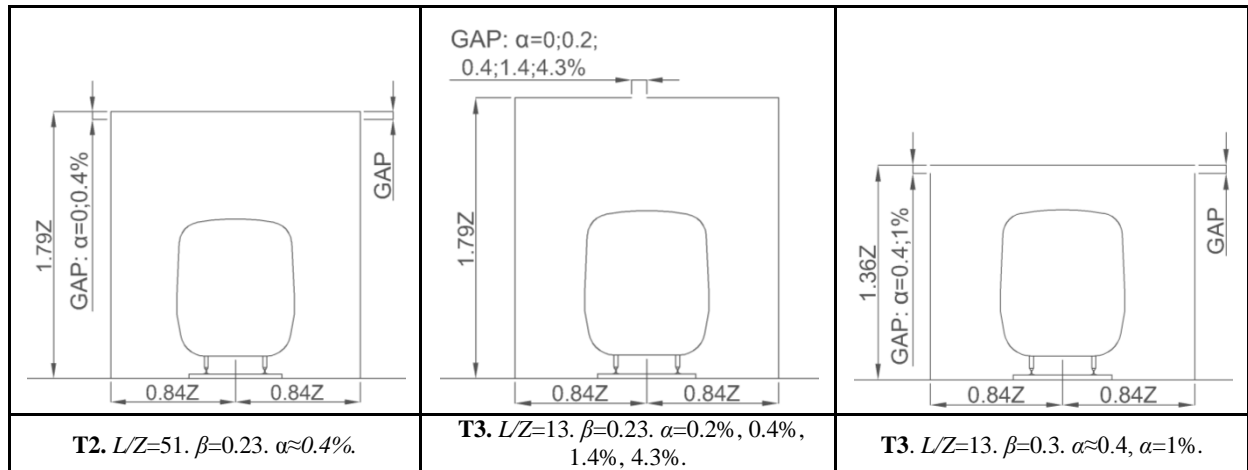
Cross-section views and geometric details of the partially-enclosed tunnels (recap).
